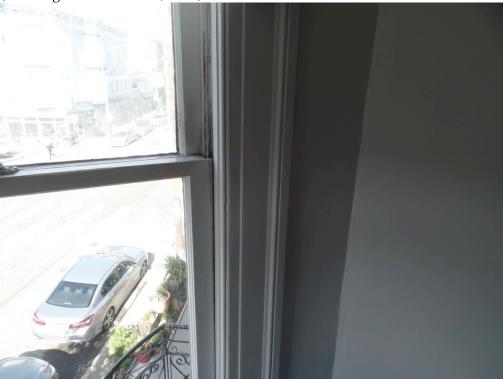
Interior view of front bay window in Unit 152A. Note damage at jamb and lower stile (Garavaglia Architecture, 2023).
